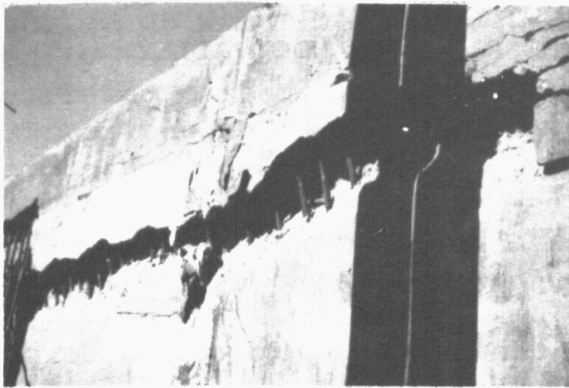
Photograph Number 6. West wall of reservoir at line 24-1/2, looking south. Wall has moved inward 3 feet and dropped about 2 feet.
